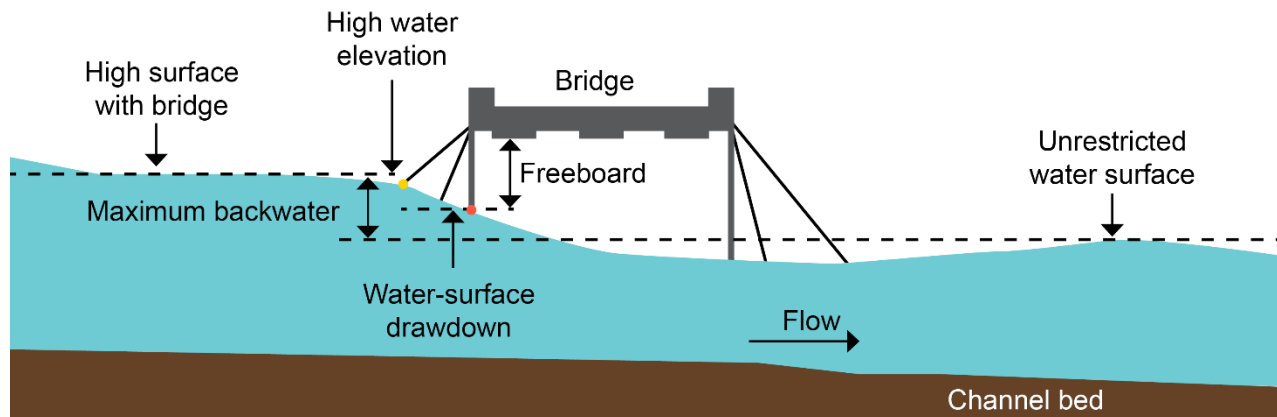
Illustration of Bridge Backwater, Highwater elevation, and Freeboard
